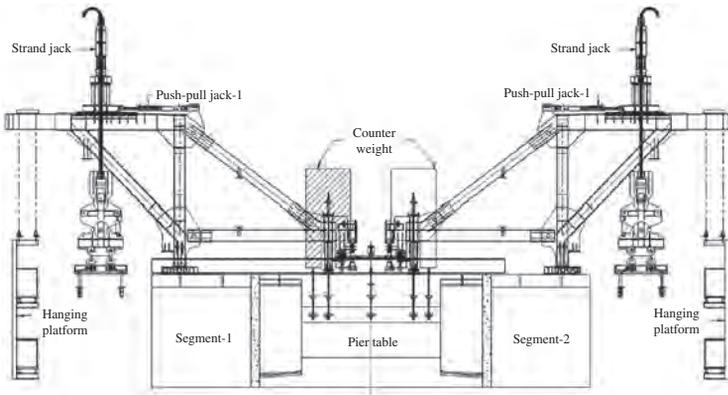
Lift and Tilt beam arrangement is mounted on Bridge Builder
